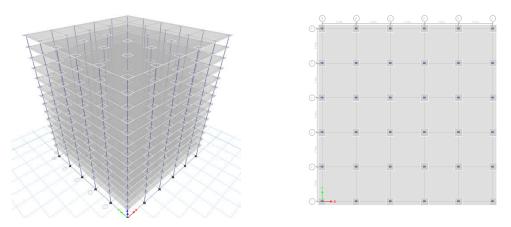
3D View of G+ 14 storey Building and Plan Area
